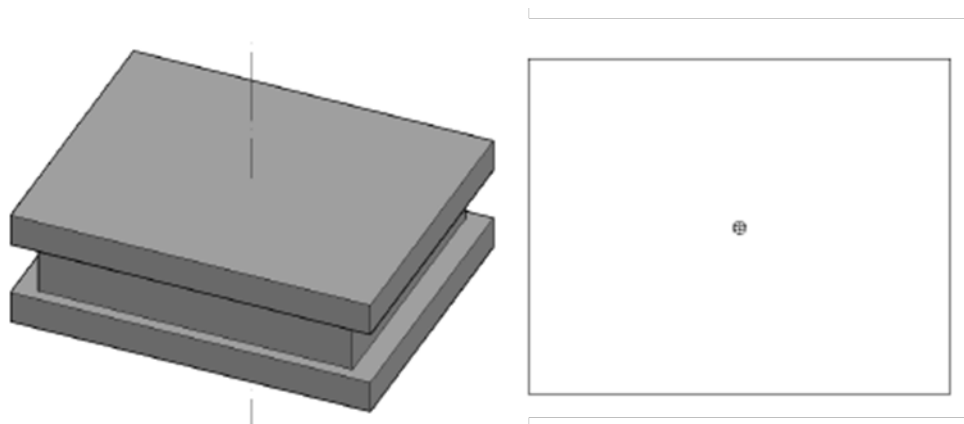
Placement Point of Bearing (Isometric View and Section View)
